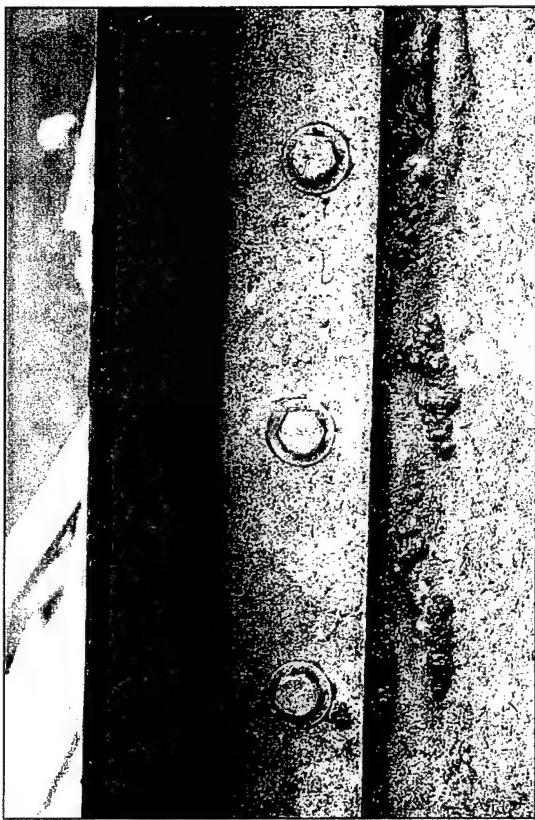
Side seal from upstream side with no signs of cracking or deterioration, typical condition.
